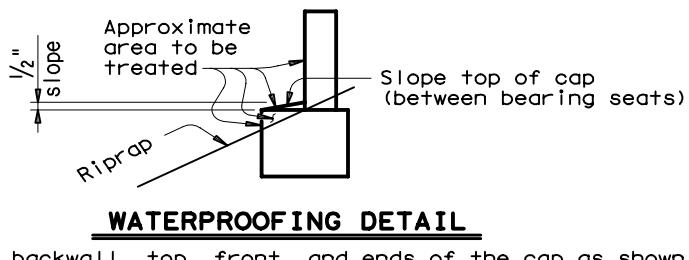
Typical Waterproofing Detail. Online users can click 3-30 to view this illustration in PDF.
